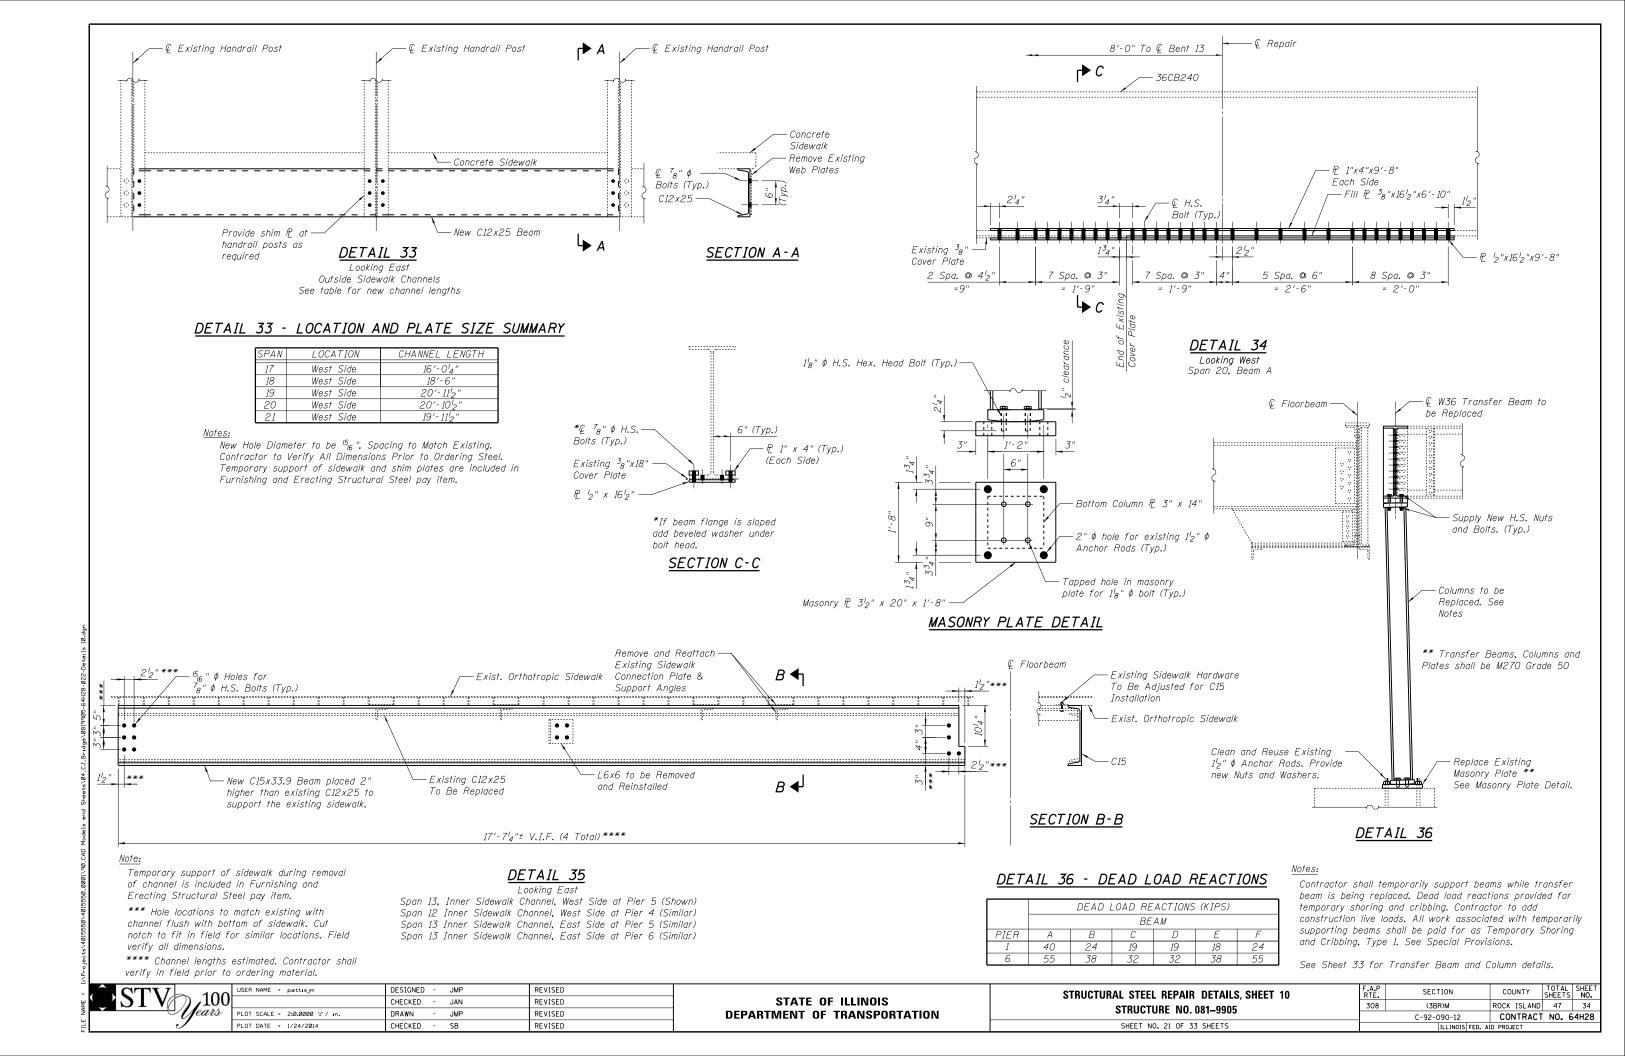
LOCATION AND PLATE SIZE SUMMARY
